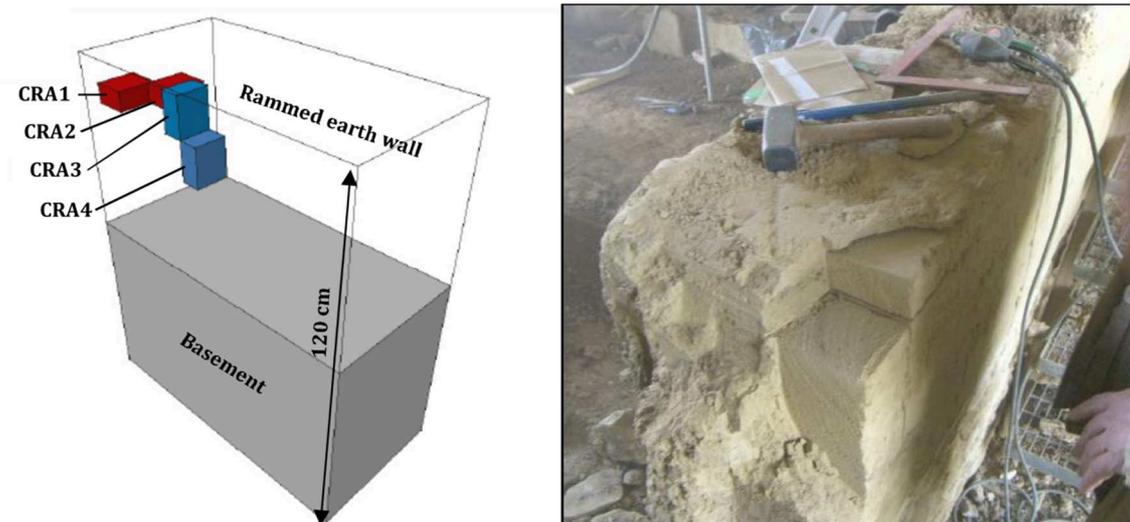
3-dimension drawing of the 4 specimens sampling performed in the rammed earth wall (on left) and picture of the wall after sampling (on right).
